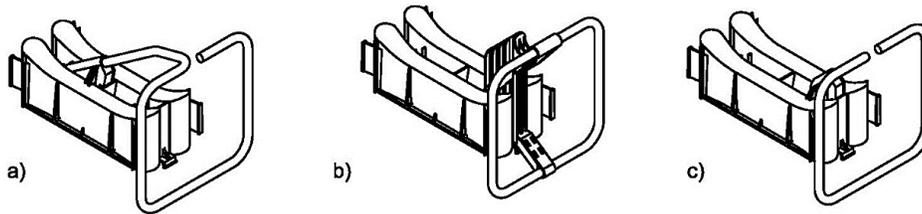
CONCRETE COMPRESSION BEARING (CCB) WITH SPECIAL STIRRUP
